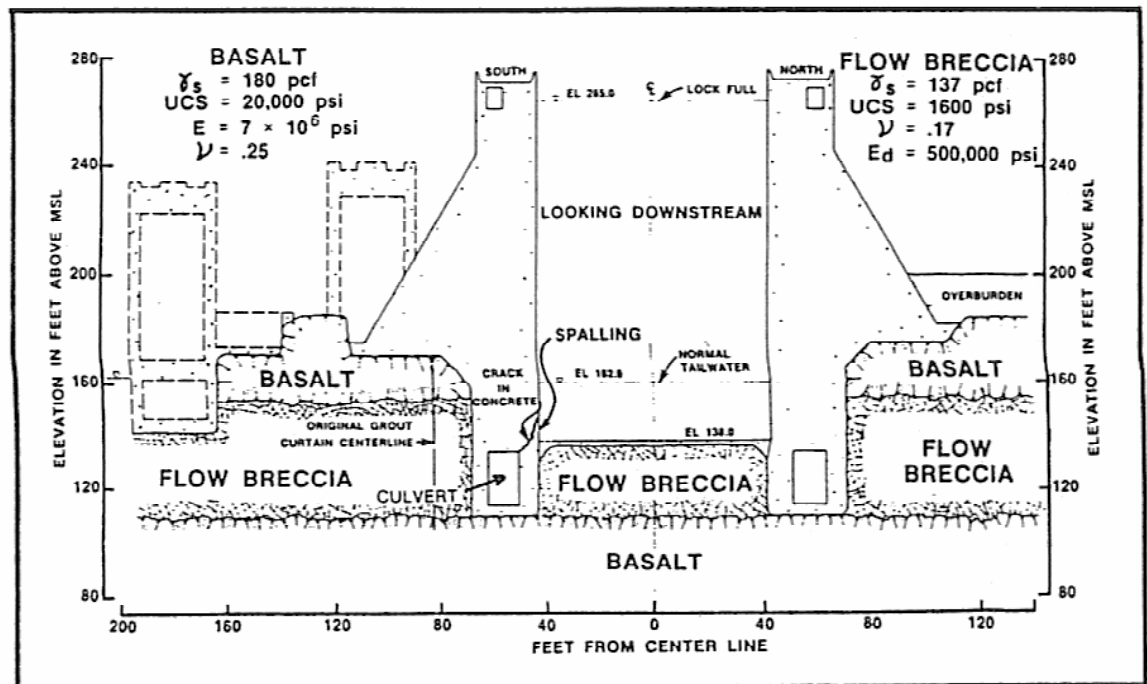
Cross section of lock, John Day Lock and Dam (59).
